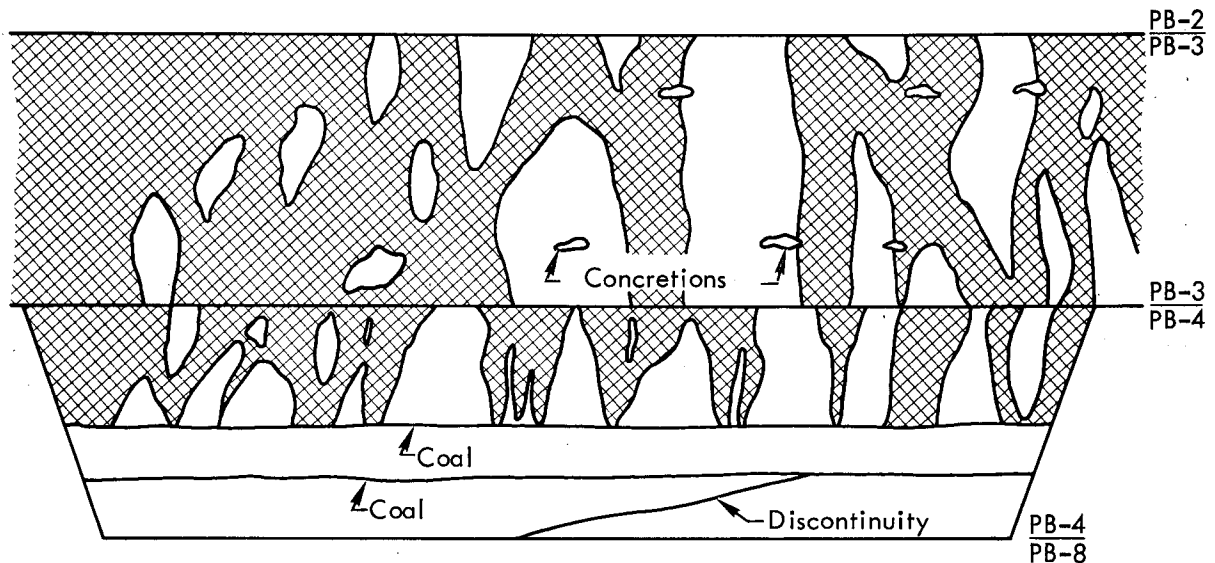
Appearance of back (west) wall, pilot excavation, lifts PB-3 and PB-4 above coals – crosshatched areas are brown-stained (from weathering along sheet joints; white areas, unweathered gray rock. (From a sketch by R. J. Lutton, WES Soils and Pavements Laboratory.)
